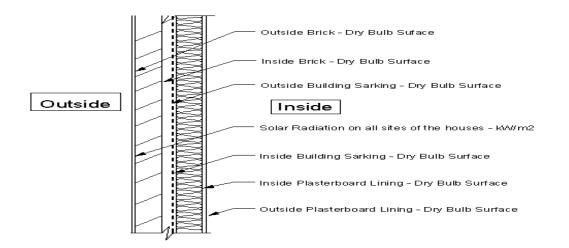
Horizontal profile of measurements taken through a northern and southern exterior brick veneer wall
